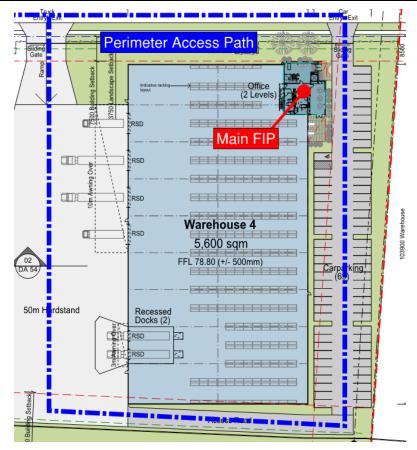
Fire Brigade Access and Site Facilities – Warehouse 4
